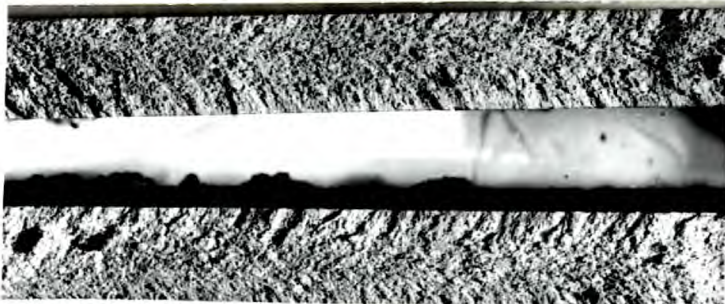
Fracture surface corresponding to fig. 7.23. Half actual size.
